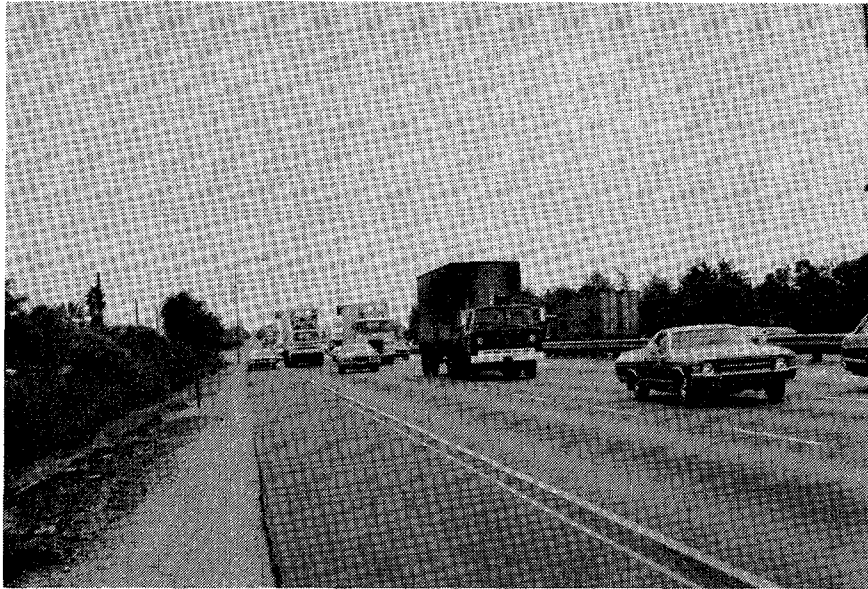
JCP-7, Jointed Concrete Pavement.
